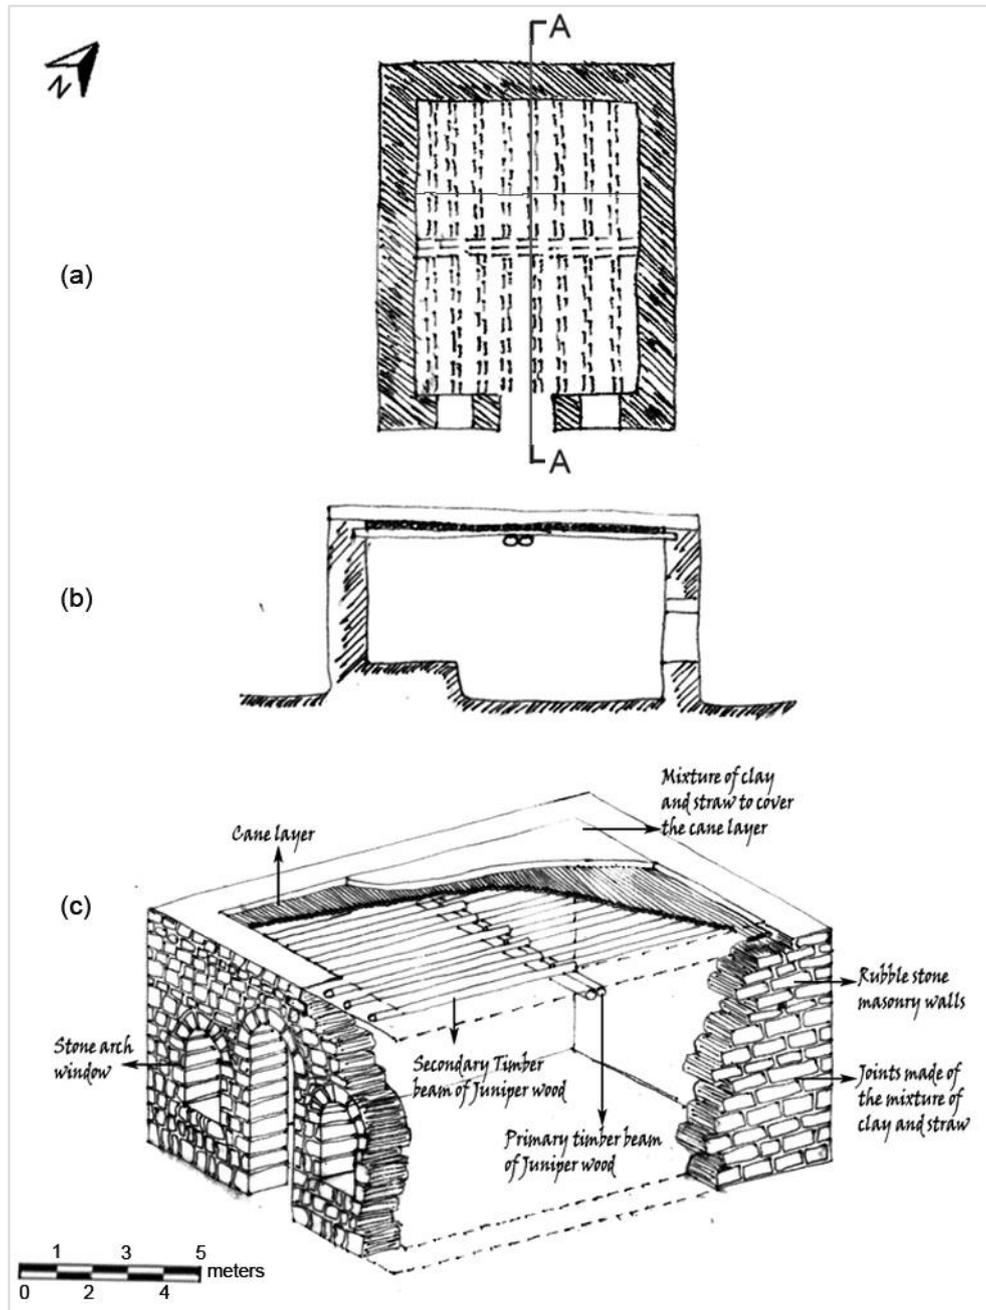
House A, a sample of the simple single-space house type: (a) plan; (b) section; (c) axonometric (Author 2019)
